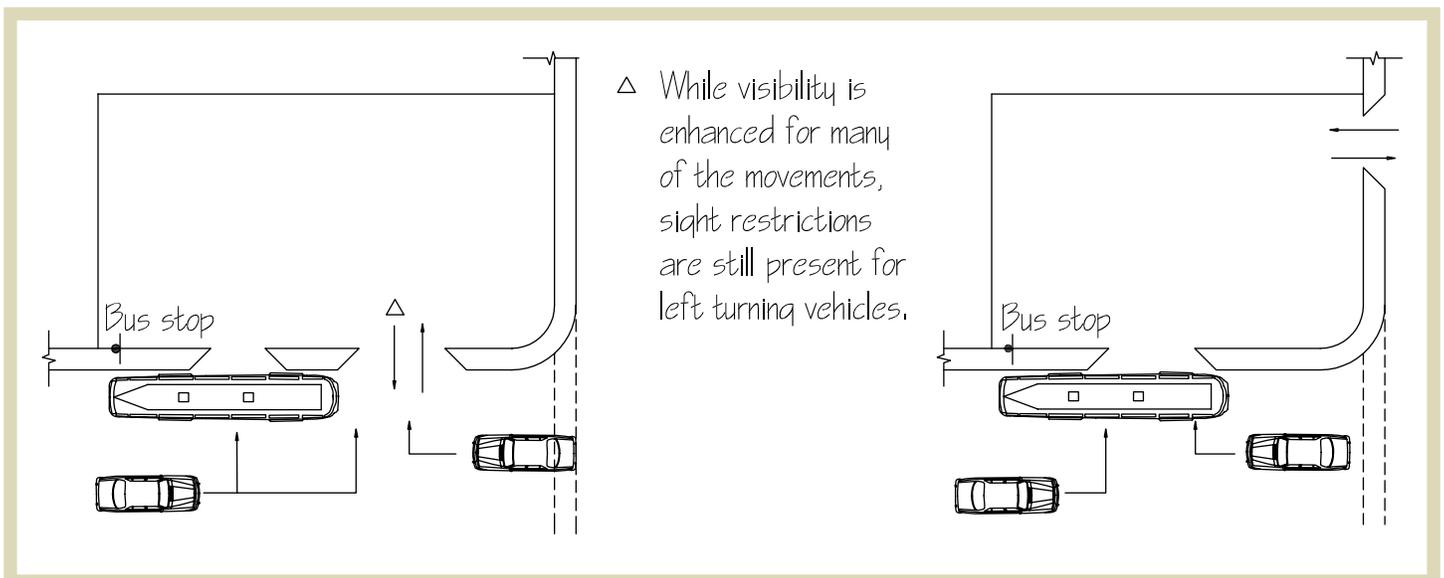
| Acceptable bus stop / driveway arrangements.
